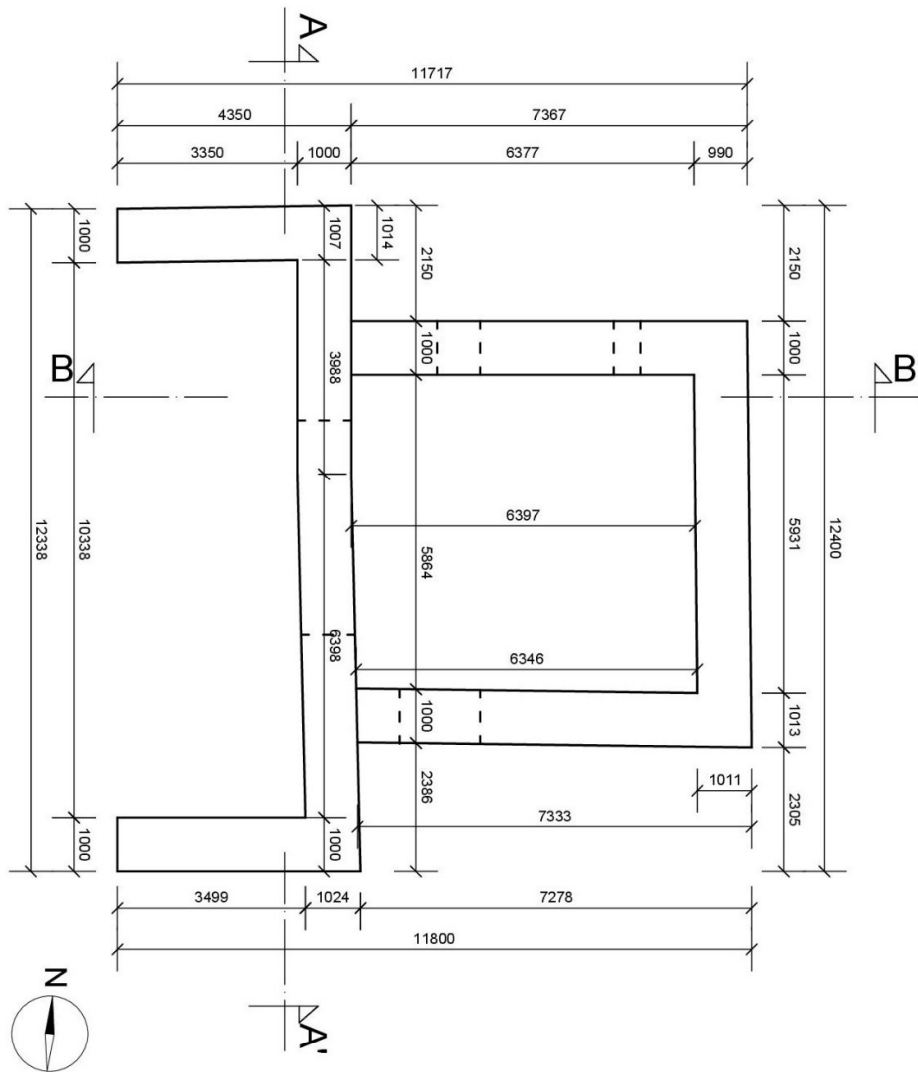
Kulumbimbi CAD Drawing Floorplan and Section A-A'
